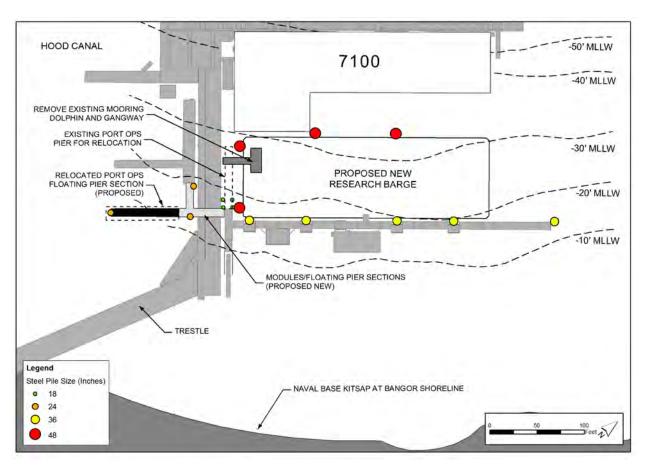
Site Plan of Proposed Barge Mooring Project
